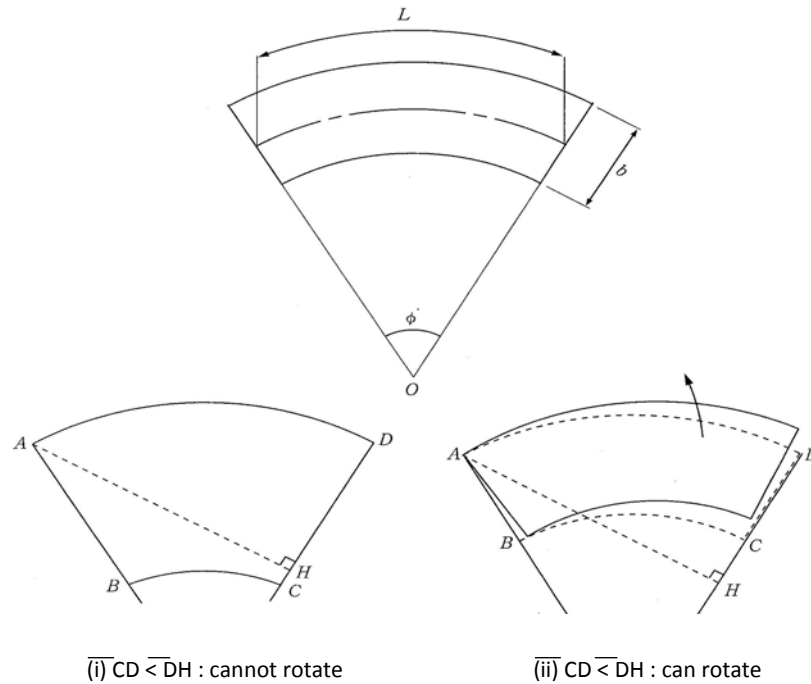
Conditions in which a Curved Bridge can Rotate Without Being Affected by Adjoining Girders or Abutment
